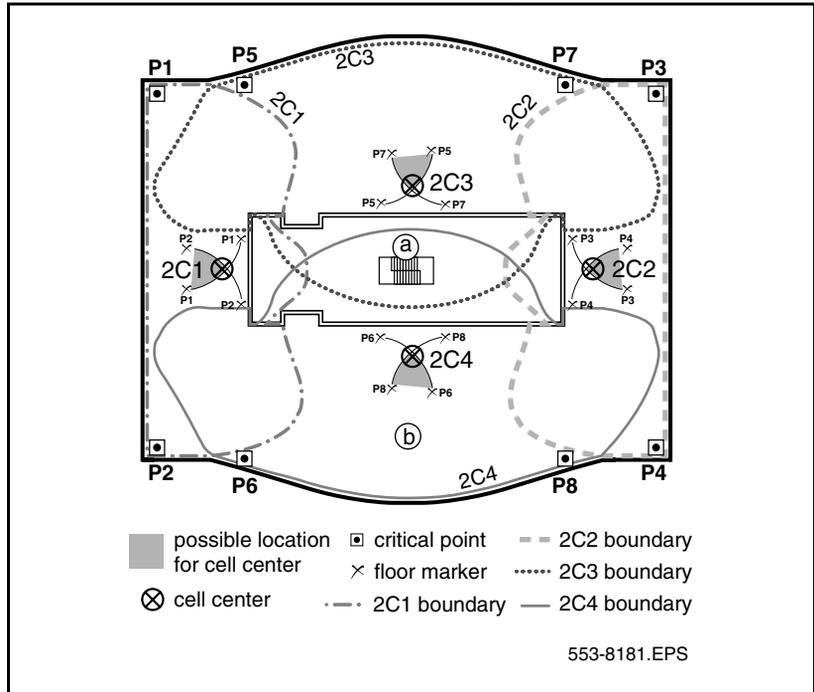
shows a typical floor plan marked-up after determining subsequent cell boundaries. The completed floor plan would appear as follows:
